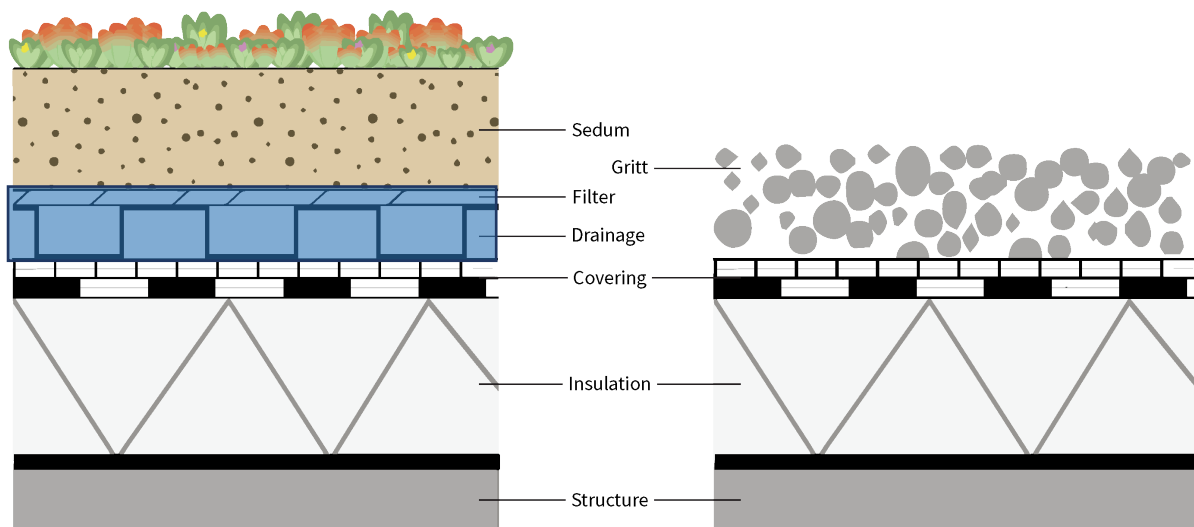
Simplified detail roof covering. Left: Sedum roof. Right: Grit roof (adapted from Groenblauw, n.d.).
